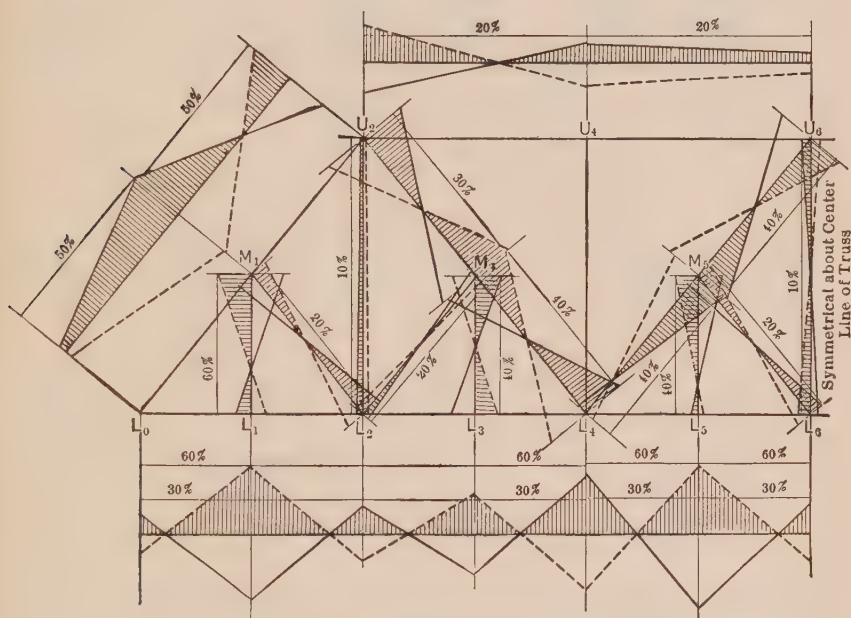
Secondary Stresses in a Subdivided Pratt Truss.
